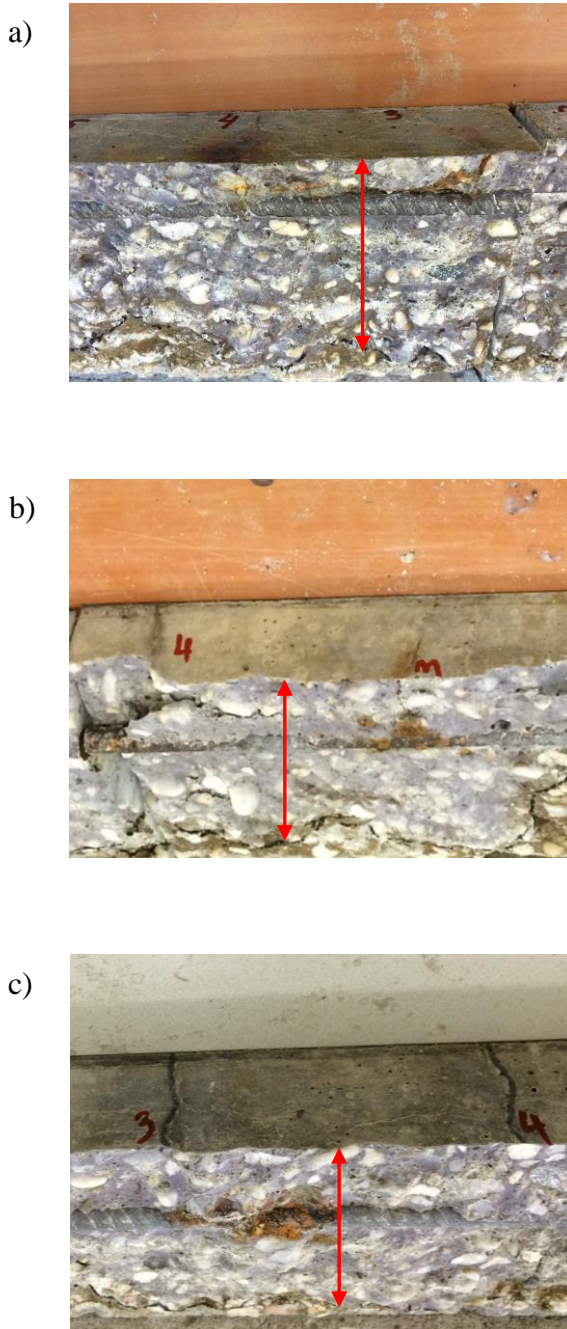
Chloride penetration in cracked concrete, between the cracks for the constant moment region, with a concrete cover of: a) 20 mm; b) 30 mm; c) 40 mm
